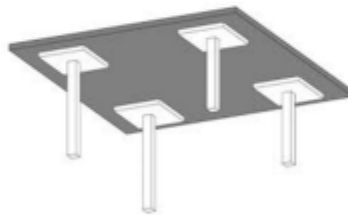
Typical shape of Reinforced Concrete Flat Slab with drop panel
